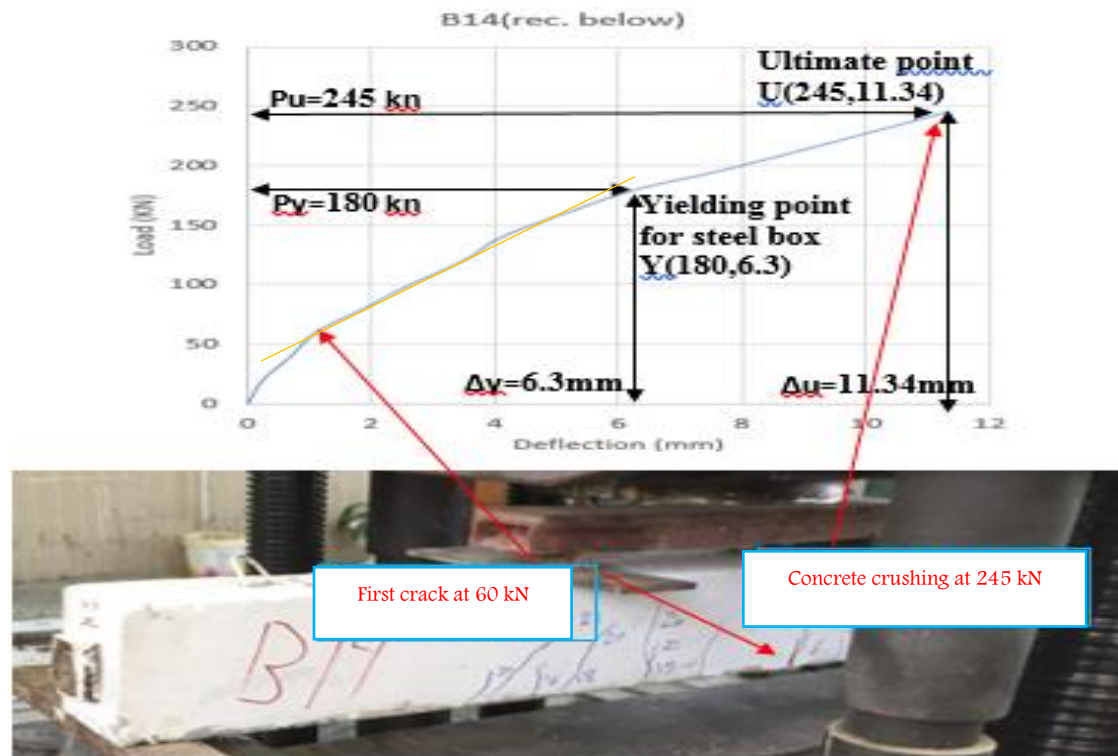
Load-deflection and crack patterns of composite hollow beam B14.
